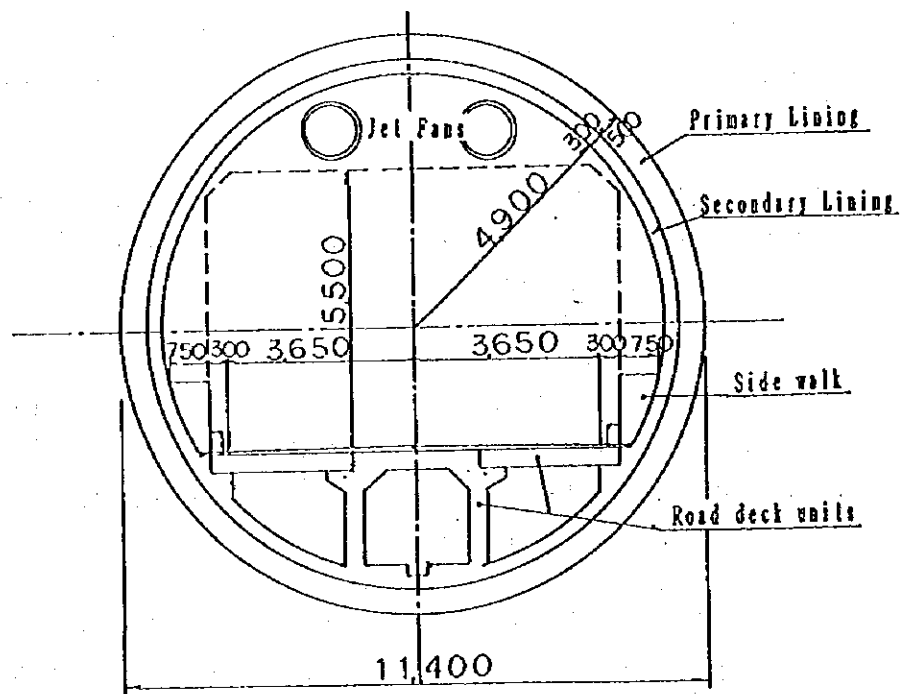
Tunnel Section Showing Primary and Secondary Lining
